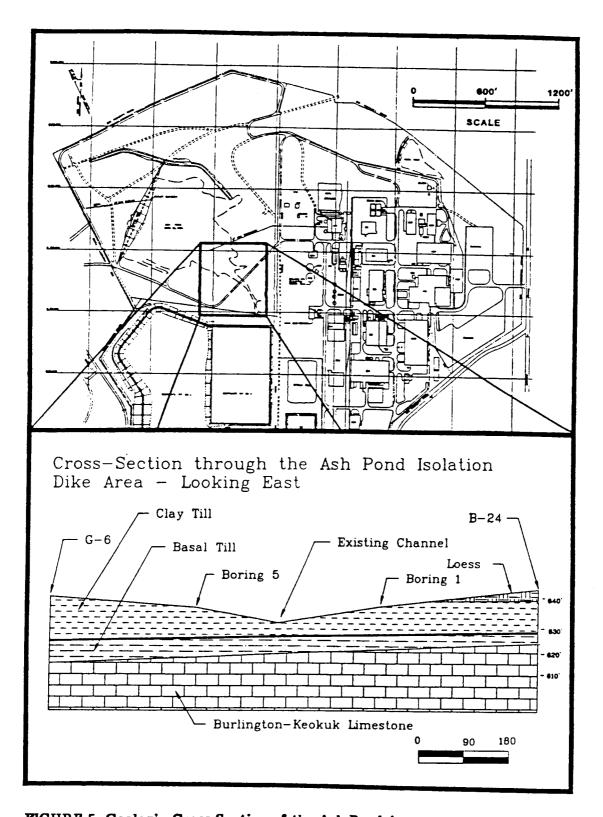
Geologic Cross Section of the Ash Pond Area
